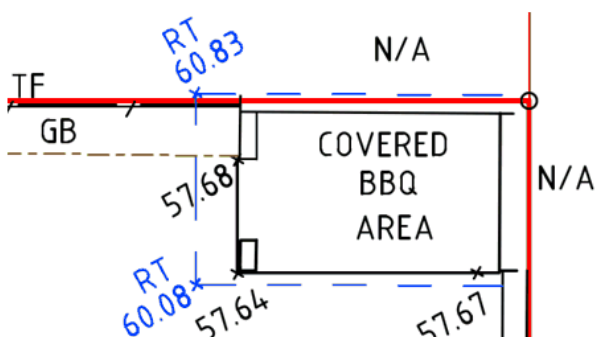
Survey plan showing the extent of the BBQ area's roof.
